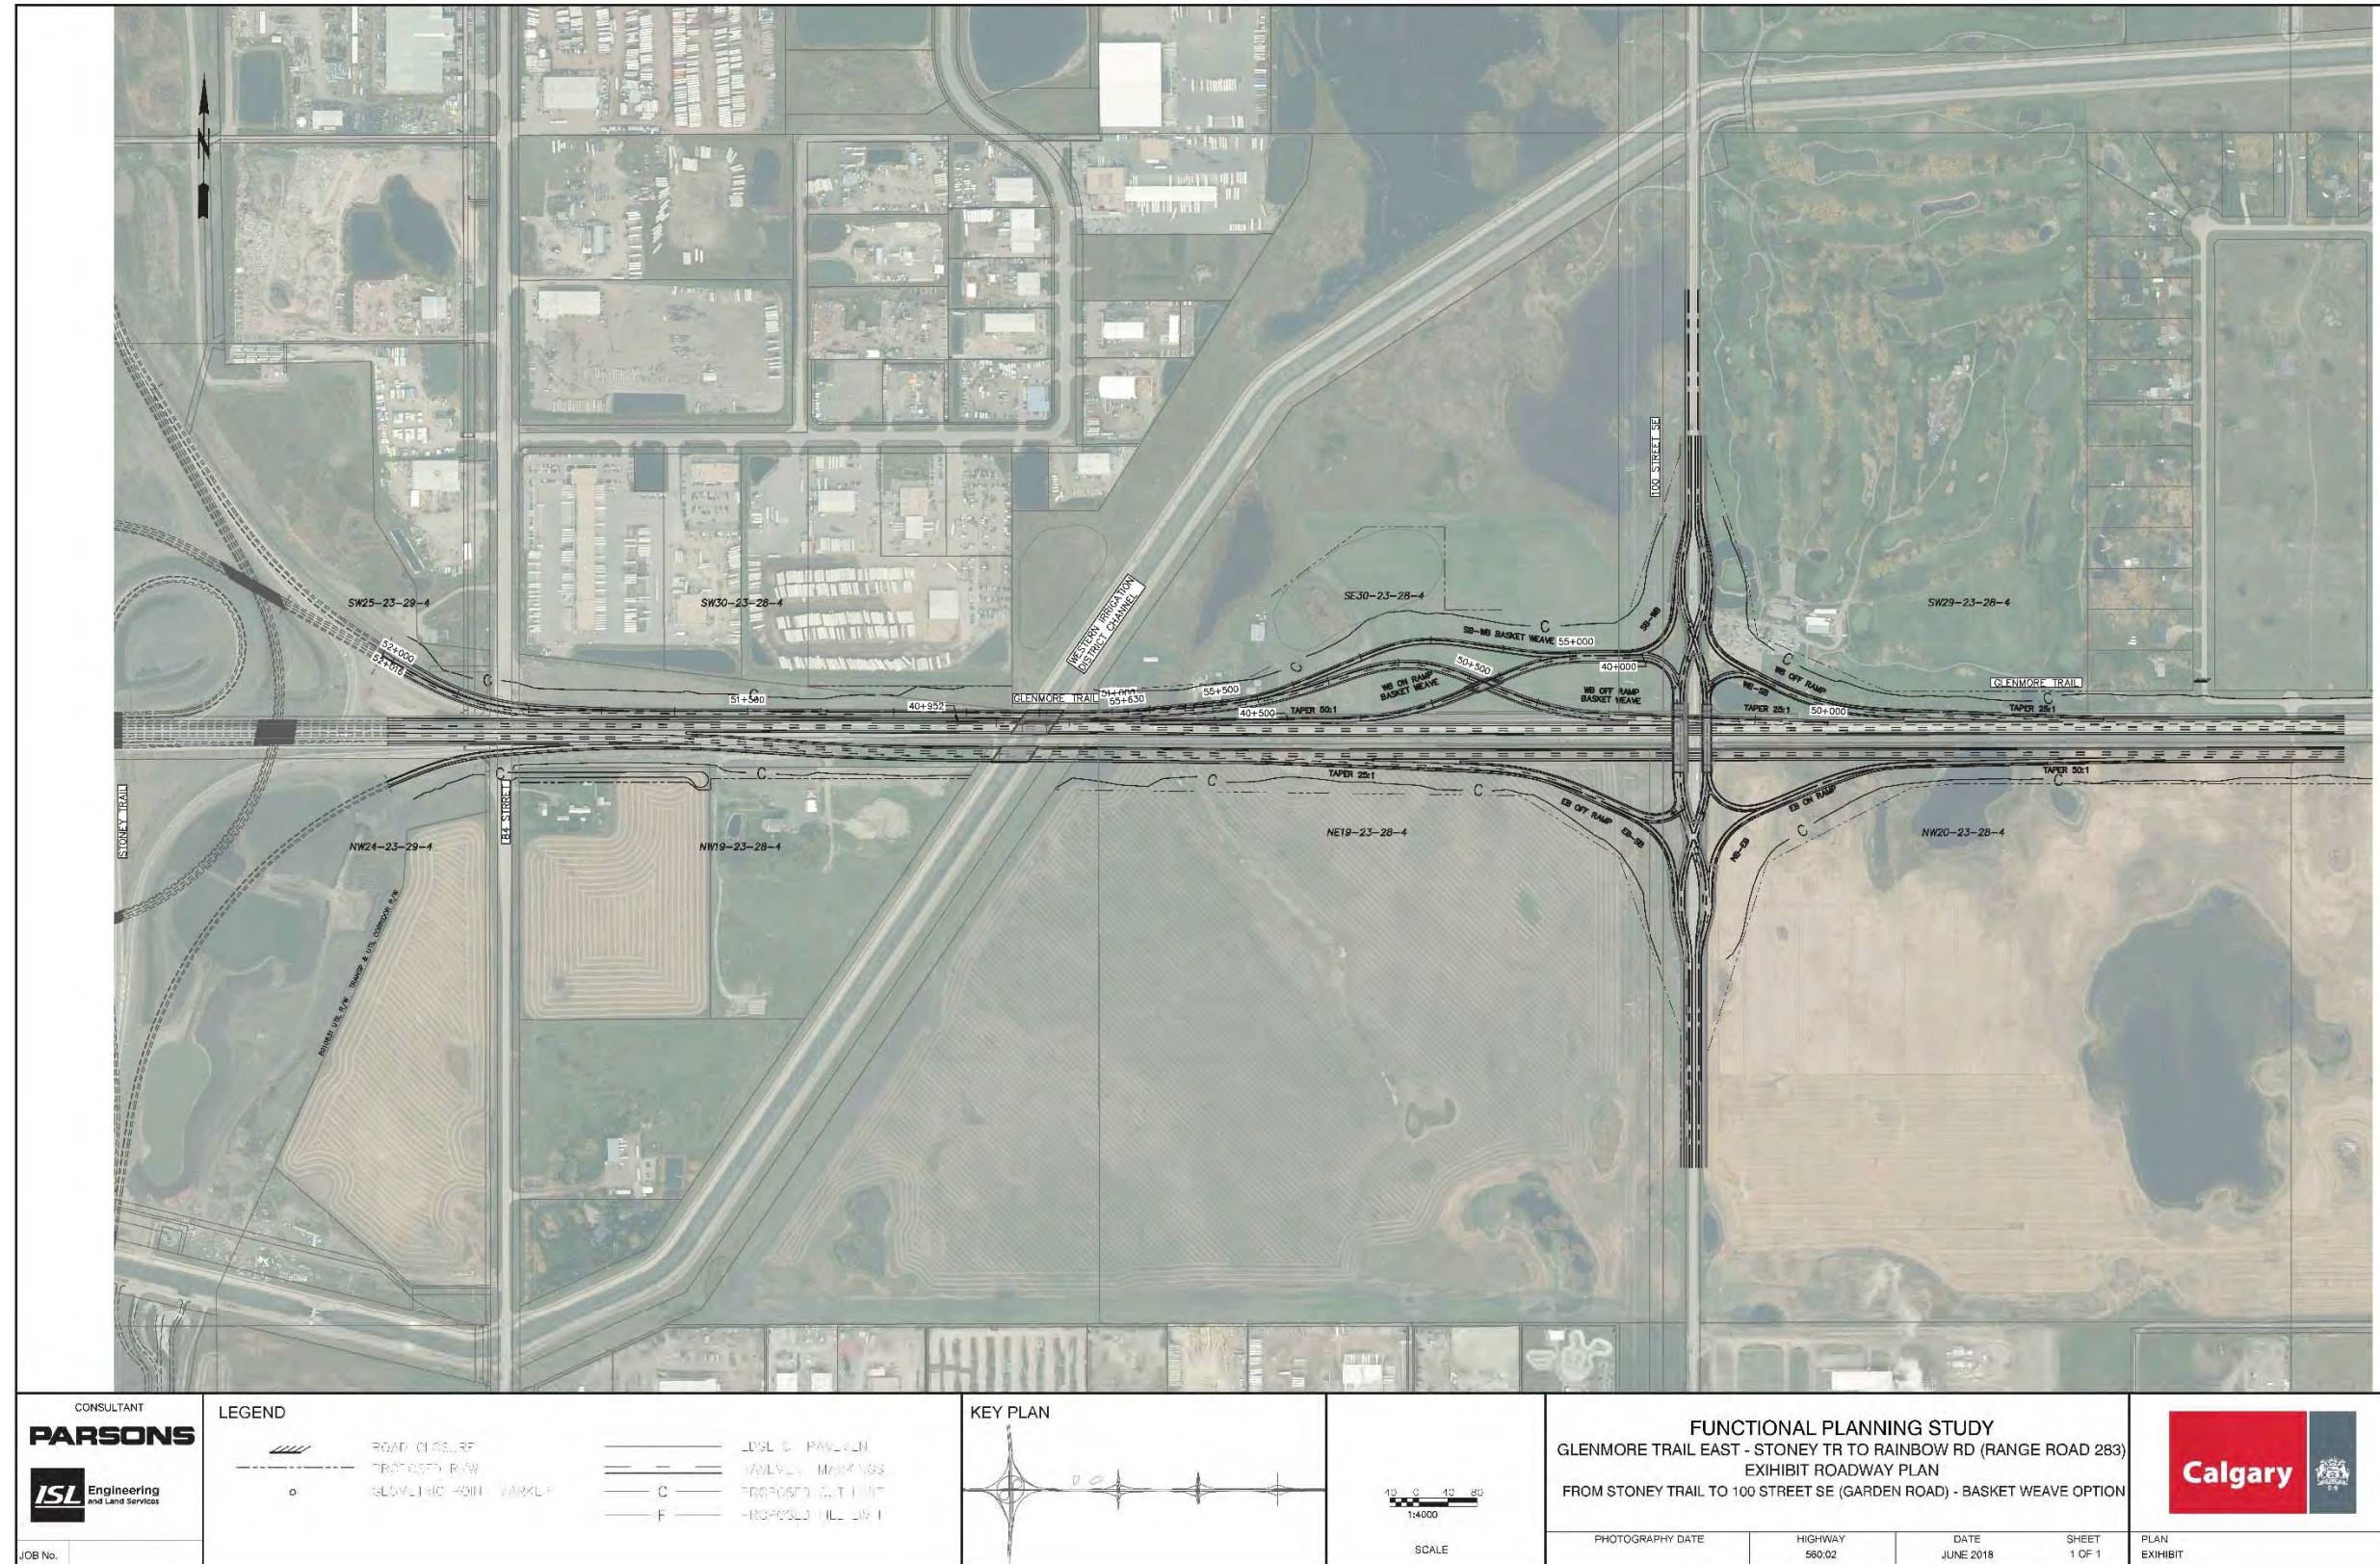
RECOMMENDED PLAN - BASKETWEAVE OPTION
